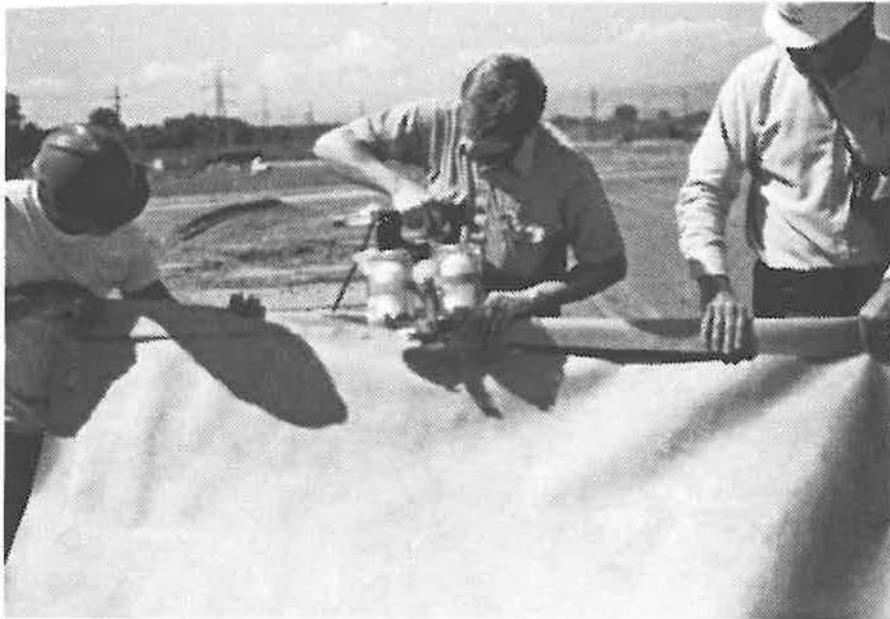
Geofabric rolls were sewed together using a double overlapped J seam
